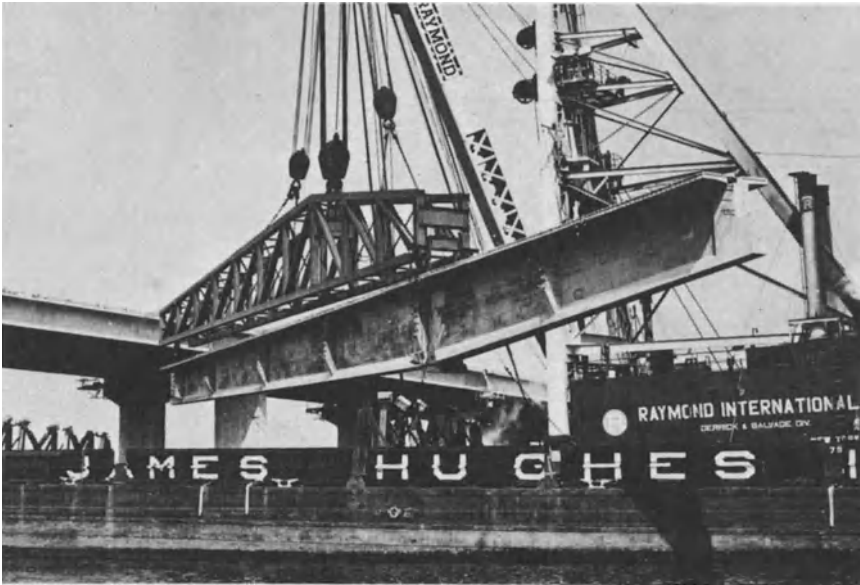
Floating crane erecting a 230-ton girder on Crossbay Parkway Bridge in New York City.
